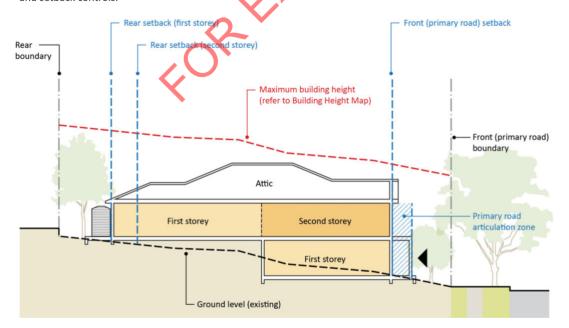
How to interpret the building height and setback controls (side elevation)
